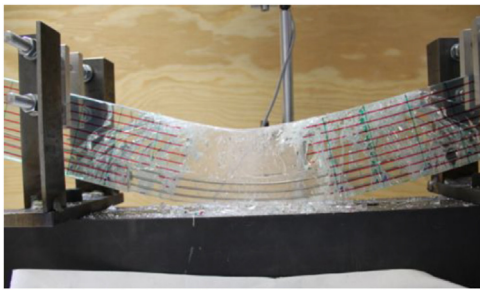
Failure configuration of the STEEL reinforced beams (front view).
